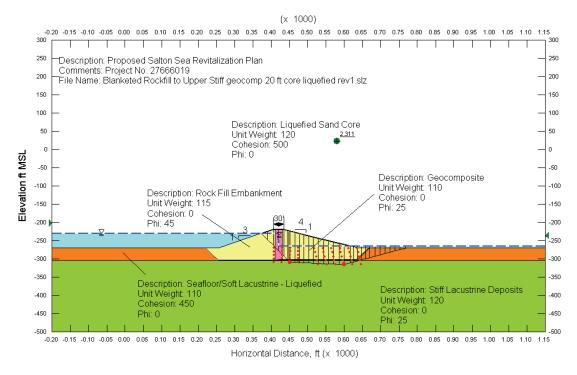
Typical cross-section of the SSA rockfill embankment.
